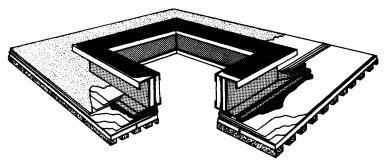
Prefabricated roof curb featuring self-flashing design. (Courtesy Penn Ventilator Co., Inc.)
